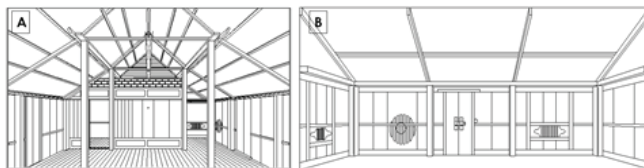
View of partion wall (A) and front wall of Tok Sedara Bongsu house
